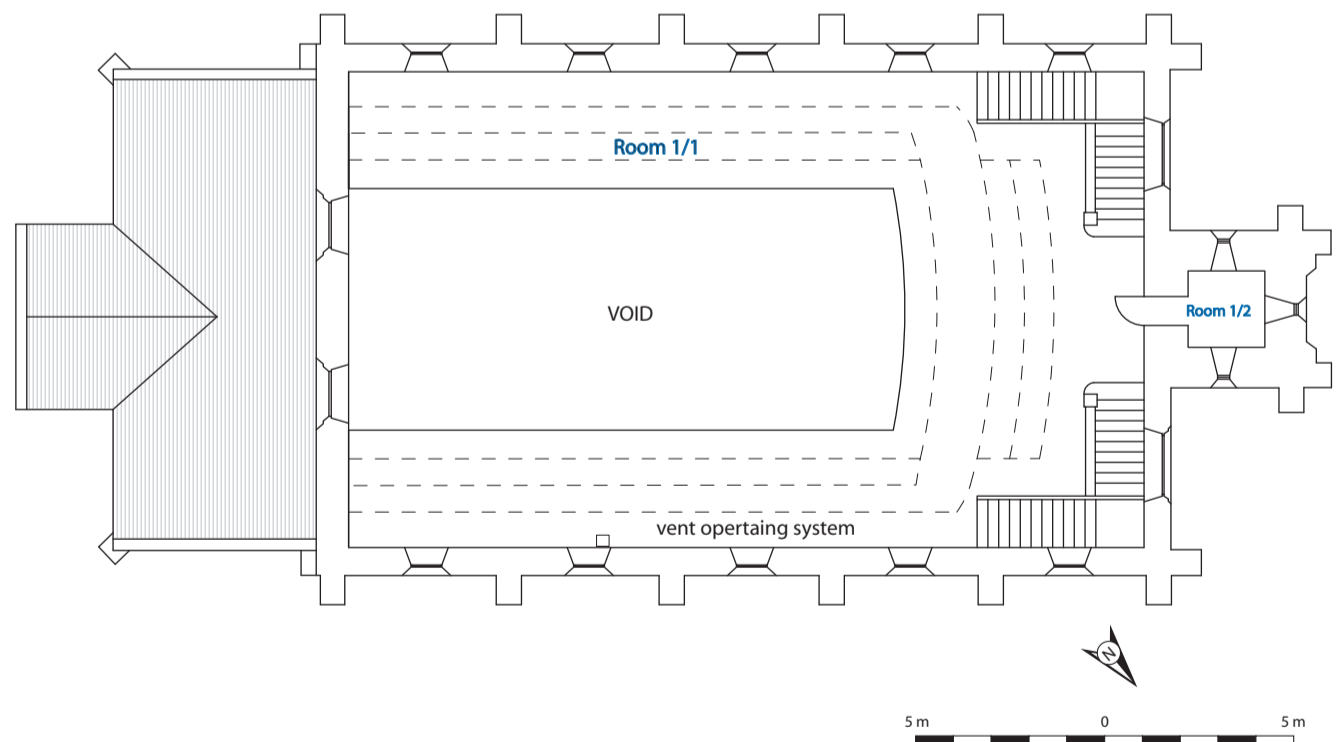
South Church, first floor plan (provided by Grant & Geogheagan Ltd)
